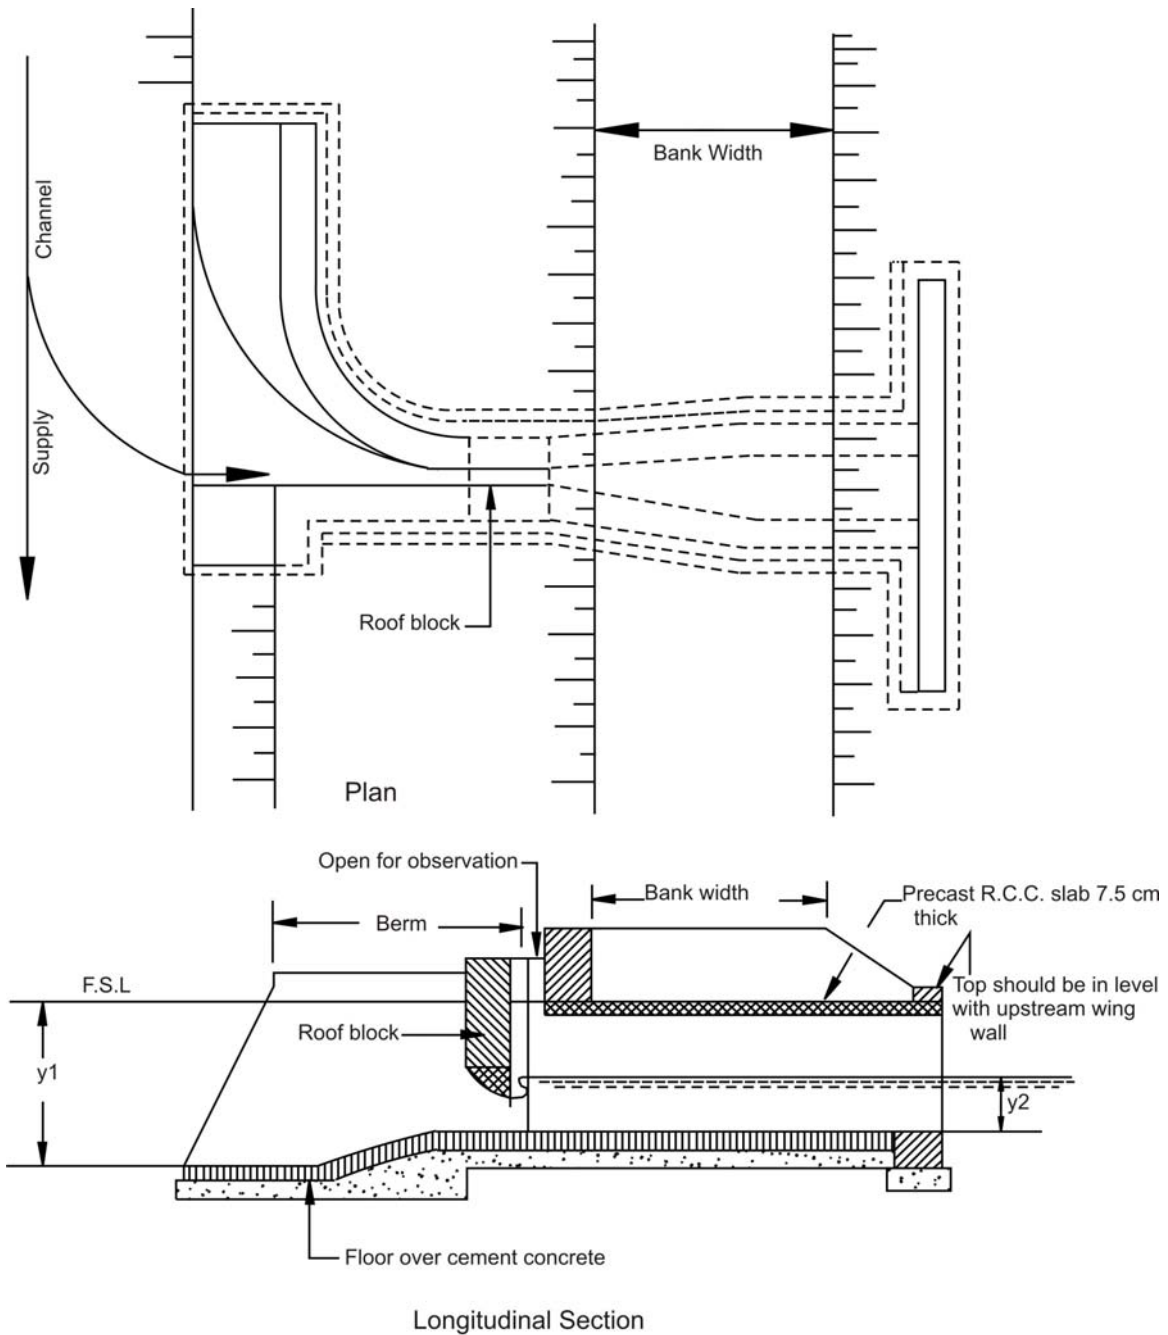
PLAN AND SECTION OF ADJUSTABLE PROPORTIONAL MODULE
